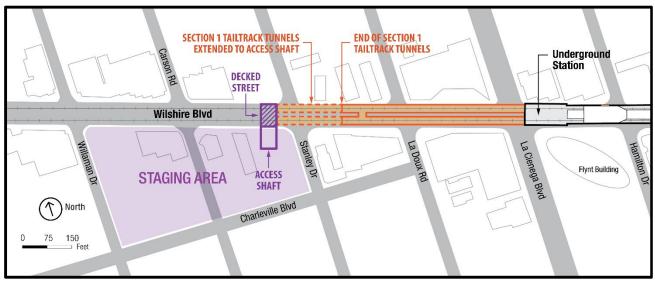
Construction Staging Area Required to Launch the Tunnel Boring Machine from Wilshire/La Cienega
